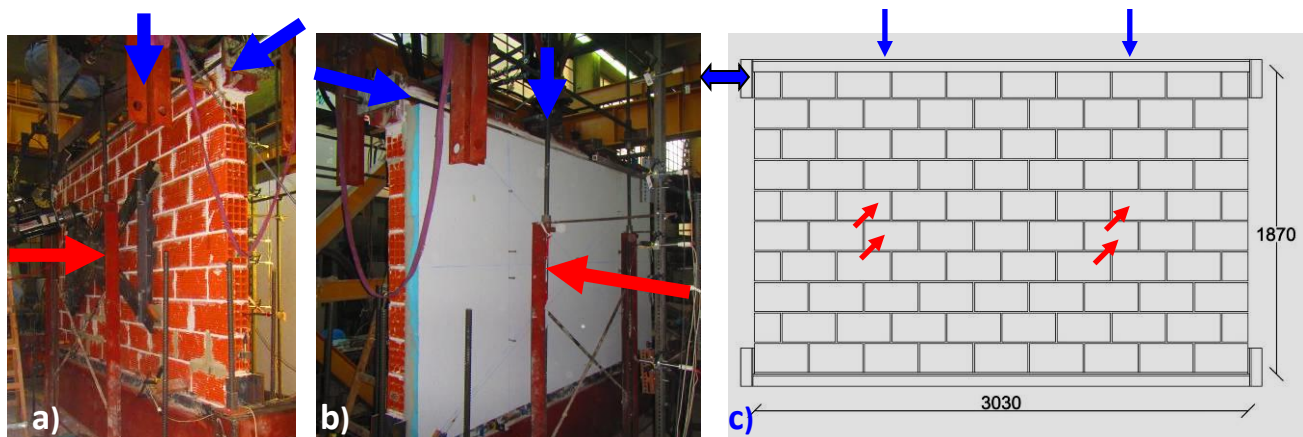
Combined in-plane and out-of-plane loading of a masonry walls. a) View from the brick façade. b) View from the thermo-insulating façade. c) Basic dimensions of wall specimens (nominal thickness 150mm).
